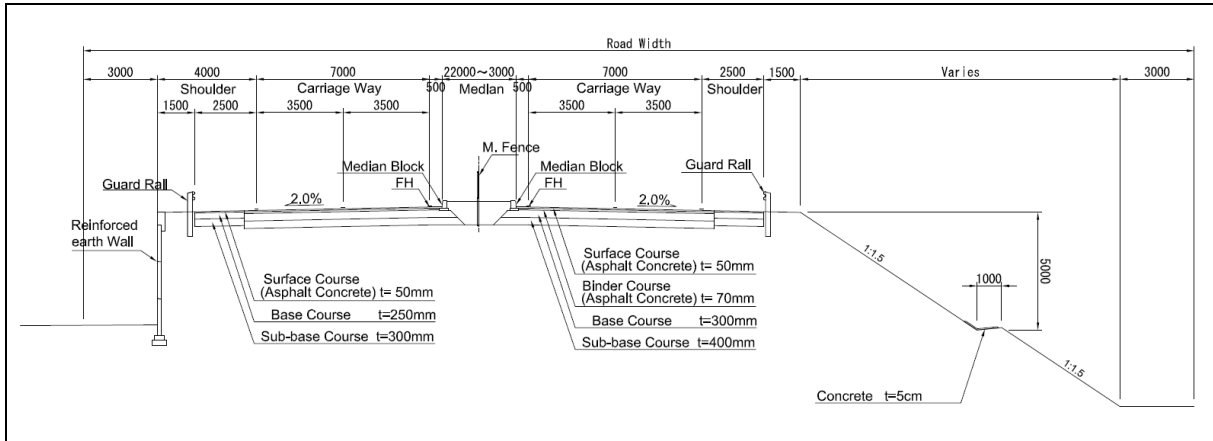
Typical Cross Section at Approach Road of Tunnel (Section 3, Section 4)
